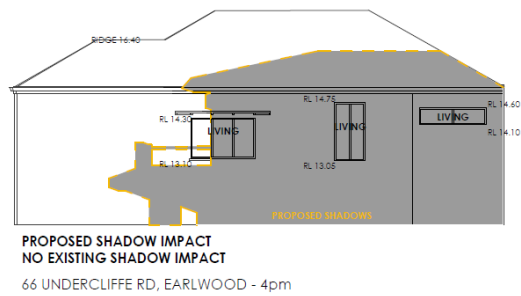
Elevational Shadow Diagrams Source: Architectural Plans Issue F
